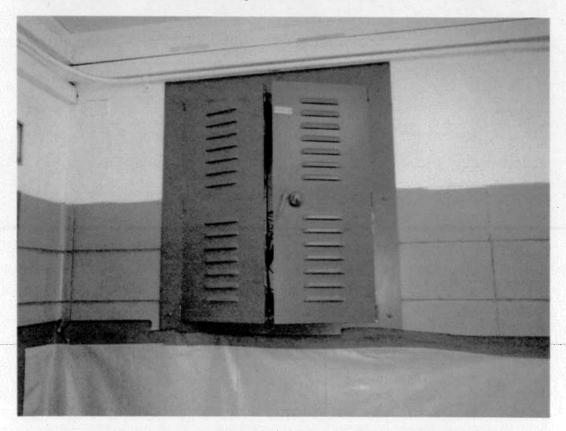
Ballast cabinet outside of Room 213 with doors closed.
